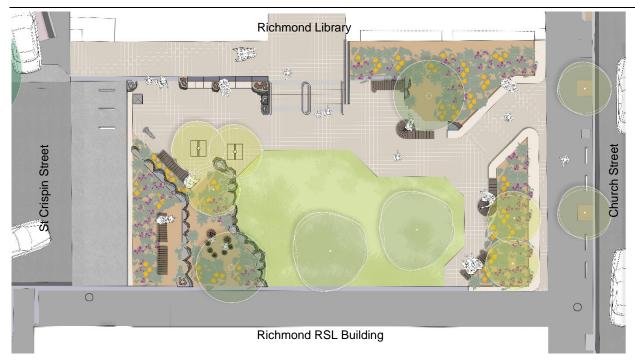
Final concept plan - in-house design and graphics. NB. Not to scale with north facing down the page to correlate with elevation view.
